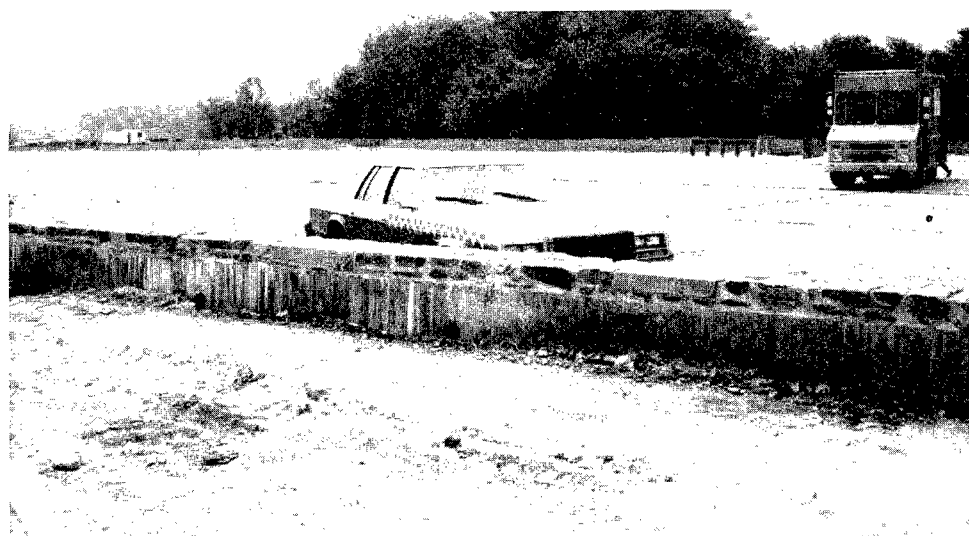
Pretest photographs of guardwall system, test 1818-5-88.
